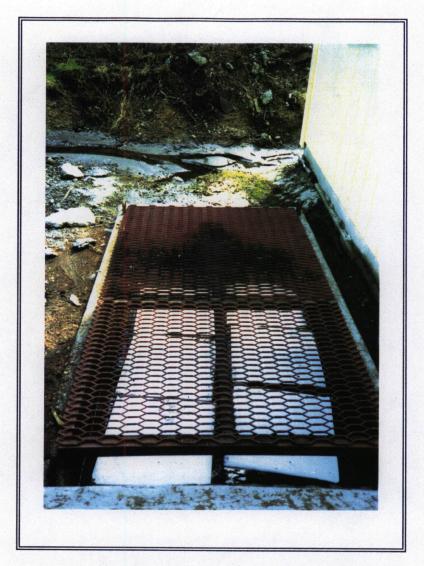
Oil skimmer in concrete, below-grade vault adjacent to waste oil storage shed (facing west).
